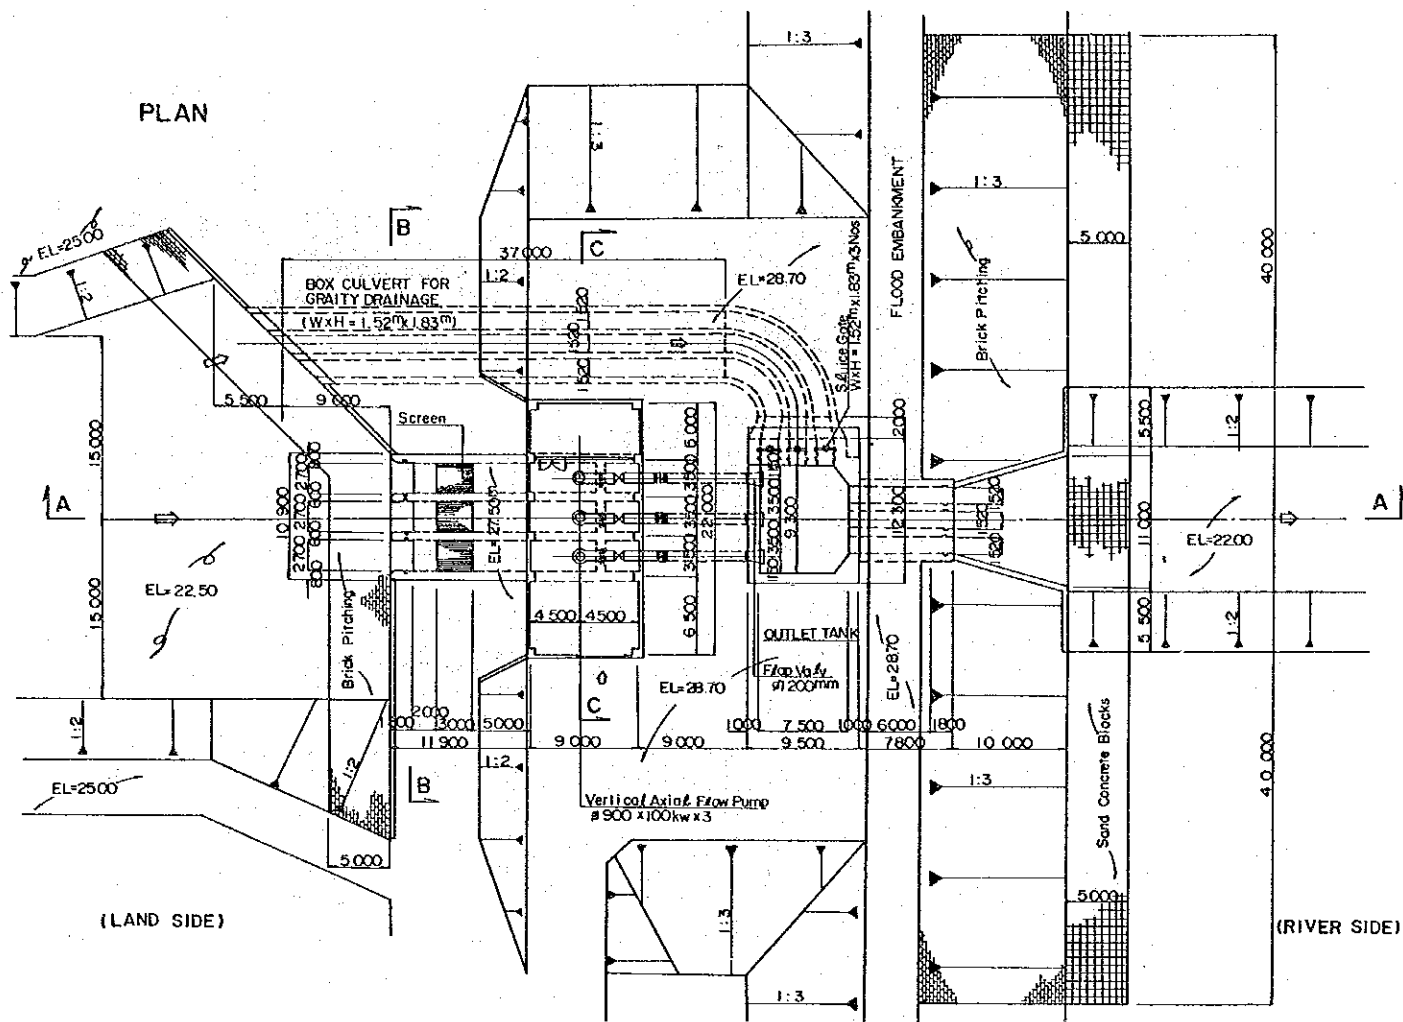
Layout of the Begomganj Drainage Pump Station
